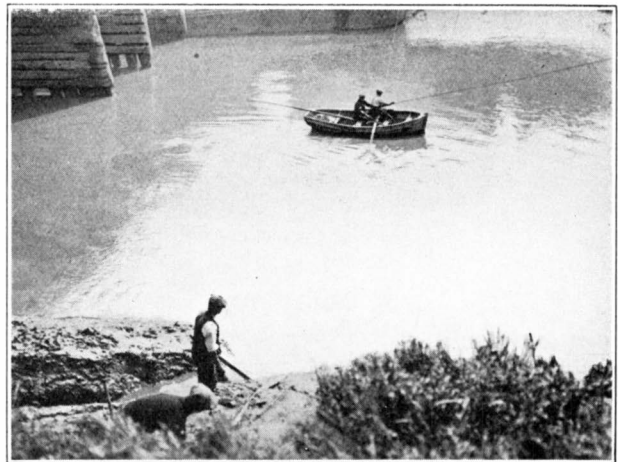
CONVEYING CABLE ACROSS RIVER.
